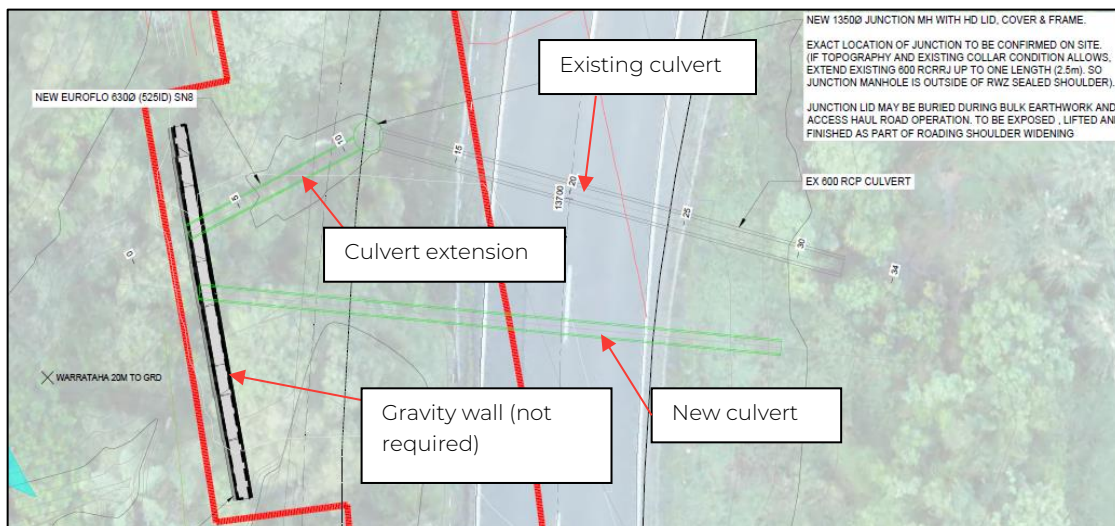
Site J existing culvert shown in grey and new culverts and manhole in green.
